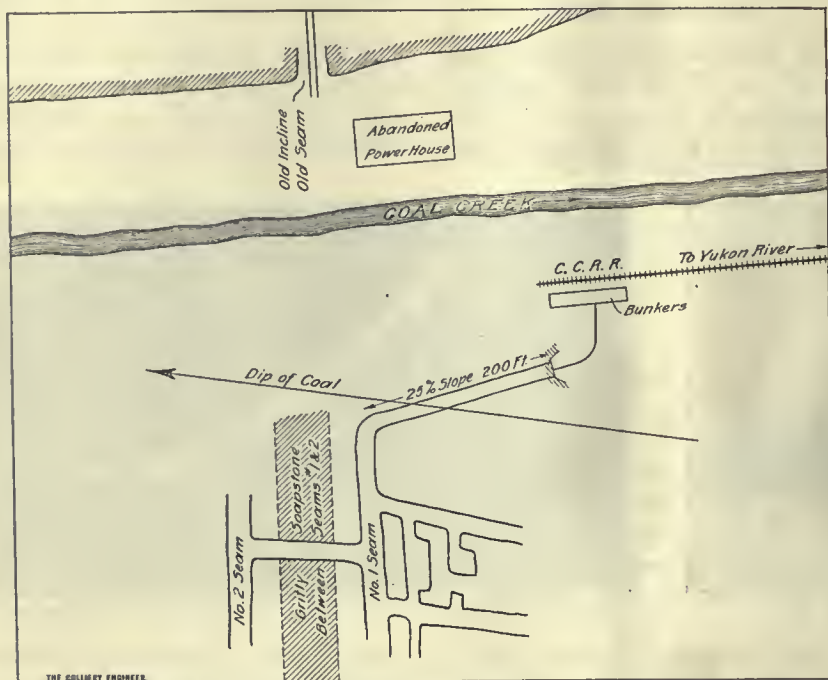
PLAN OF NORTHERN LIGHT, POWER AND COAL CO. PLANT
